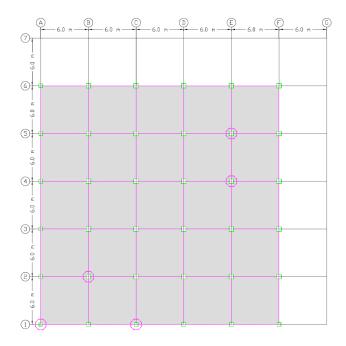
3-D finite element model of 30-storey irregular plan building Fig. 2. Plan geometry of the first tenth stories
